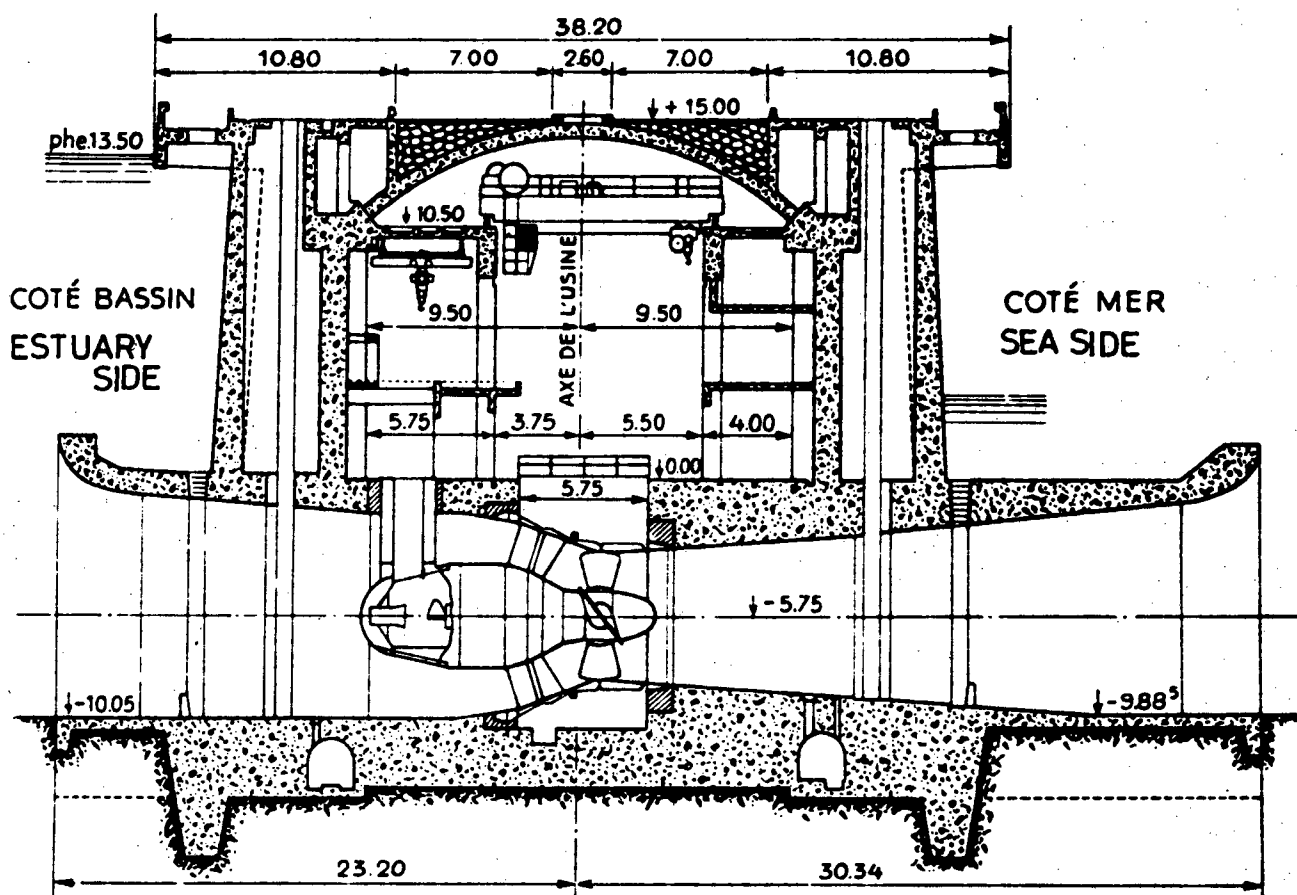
Cross section of a machinery bay (Ref. 47).
